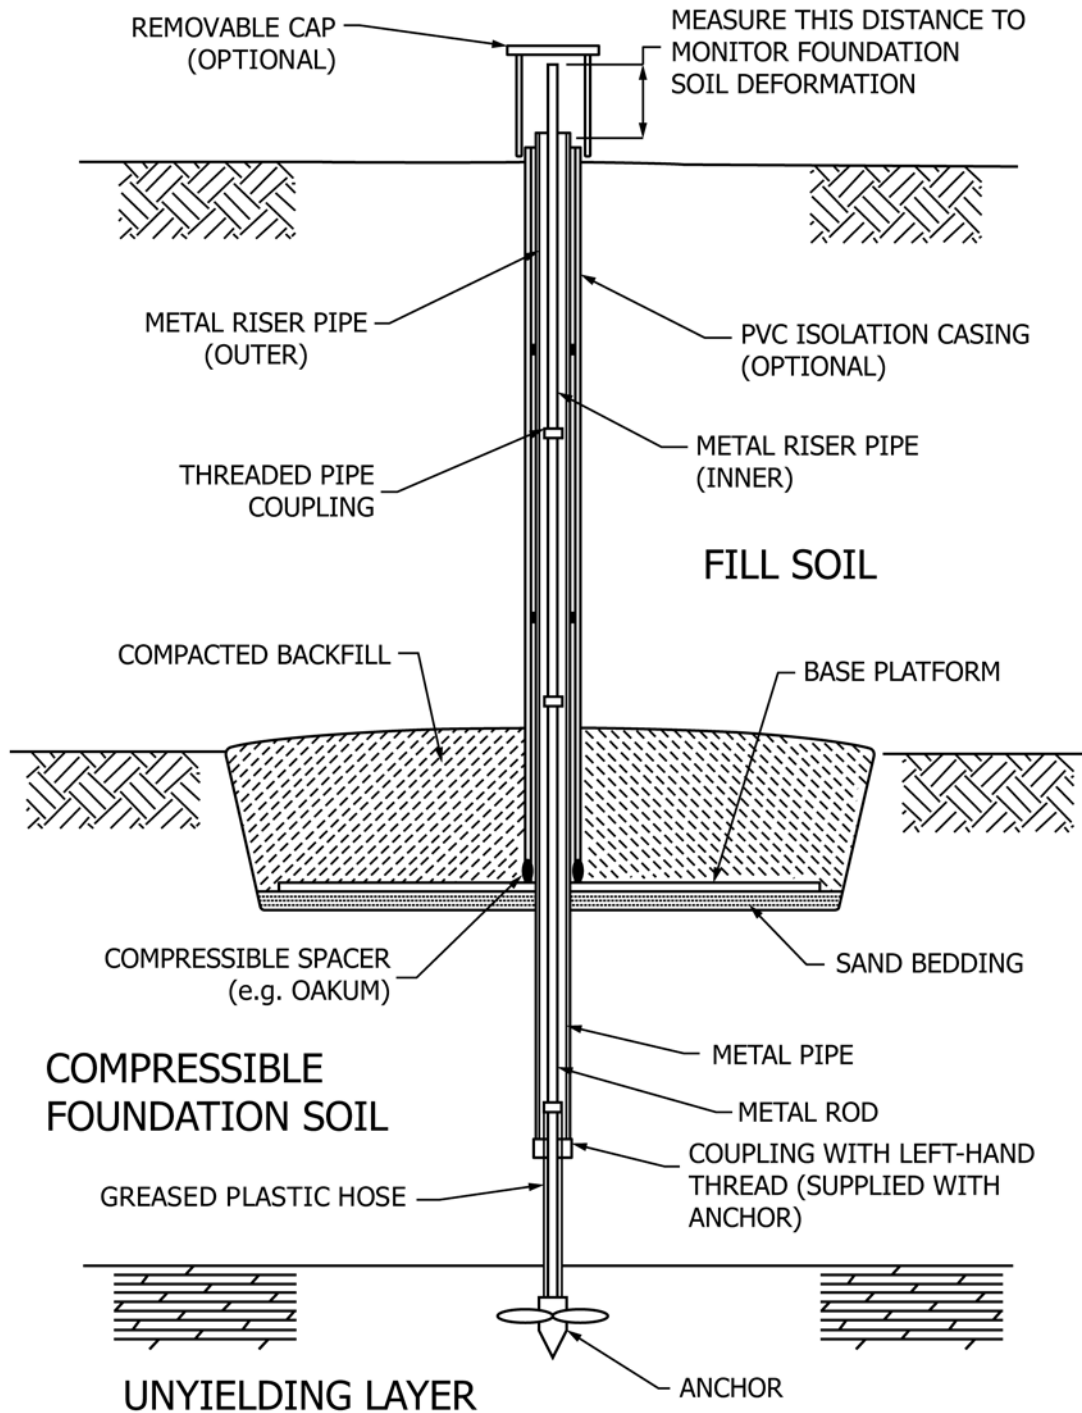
Typical Installation for Internally Referenced Settlement Platform with Borros Anchor
